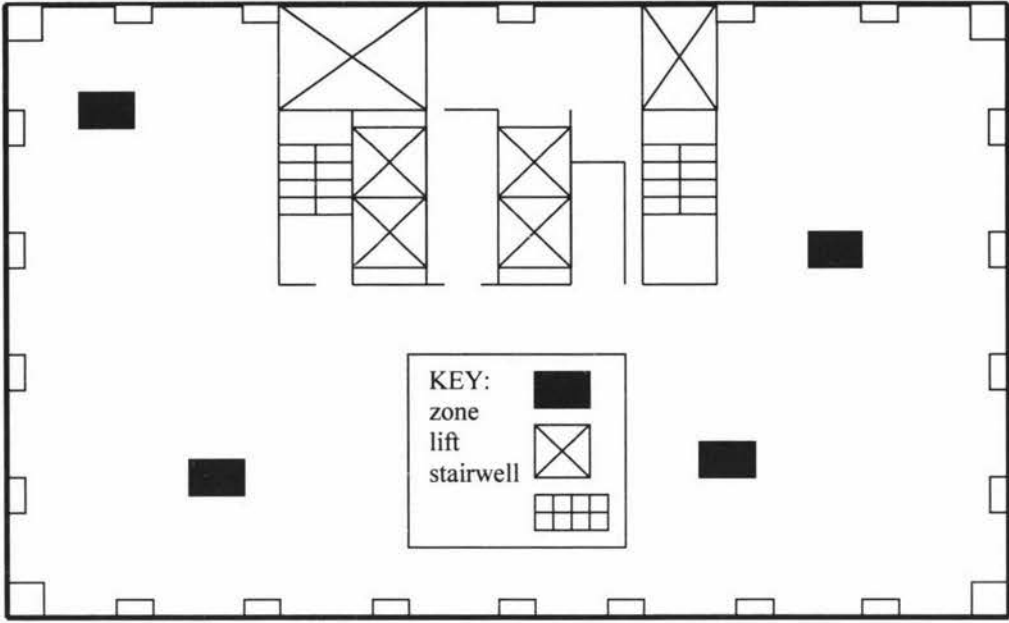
Floor plan of building three outlining the sampling zones selected on all three levels (not to scale).
